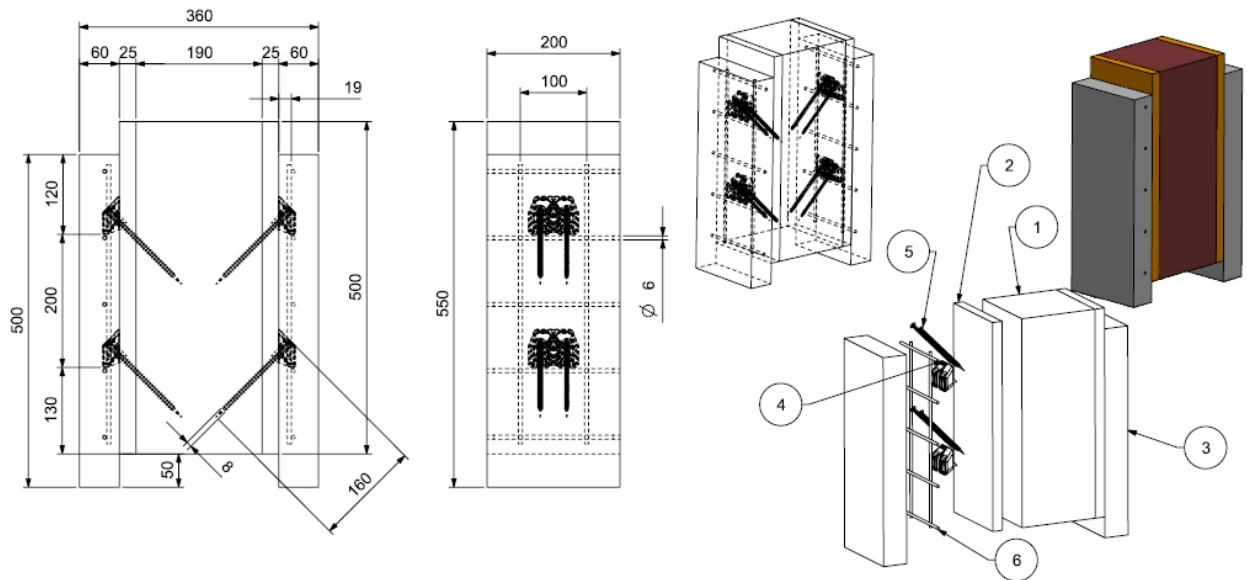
Geometry of specimens with a 25-mm timber planks interlayer.
